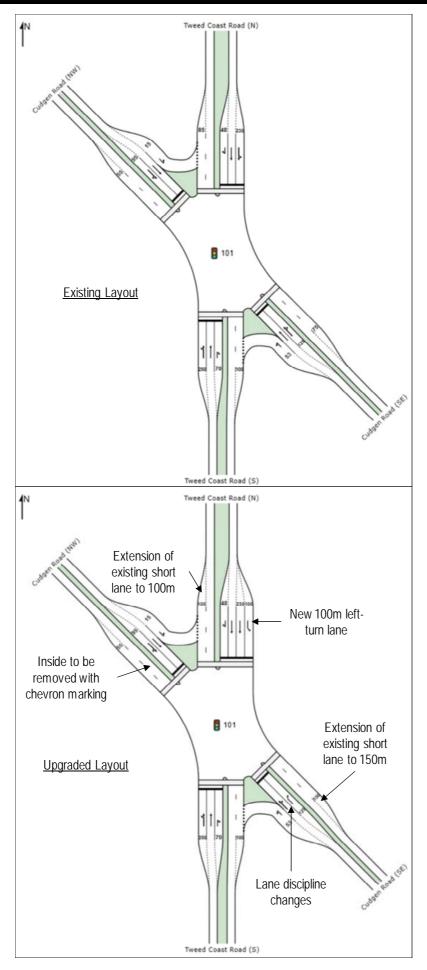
Tweed Coast Road / Cudgen Road SIDRA Intersection Layout – Upgrade 1
